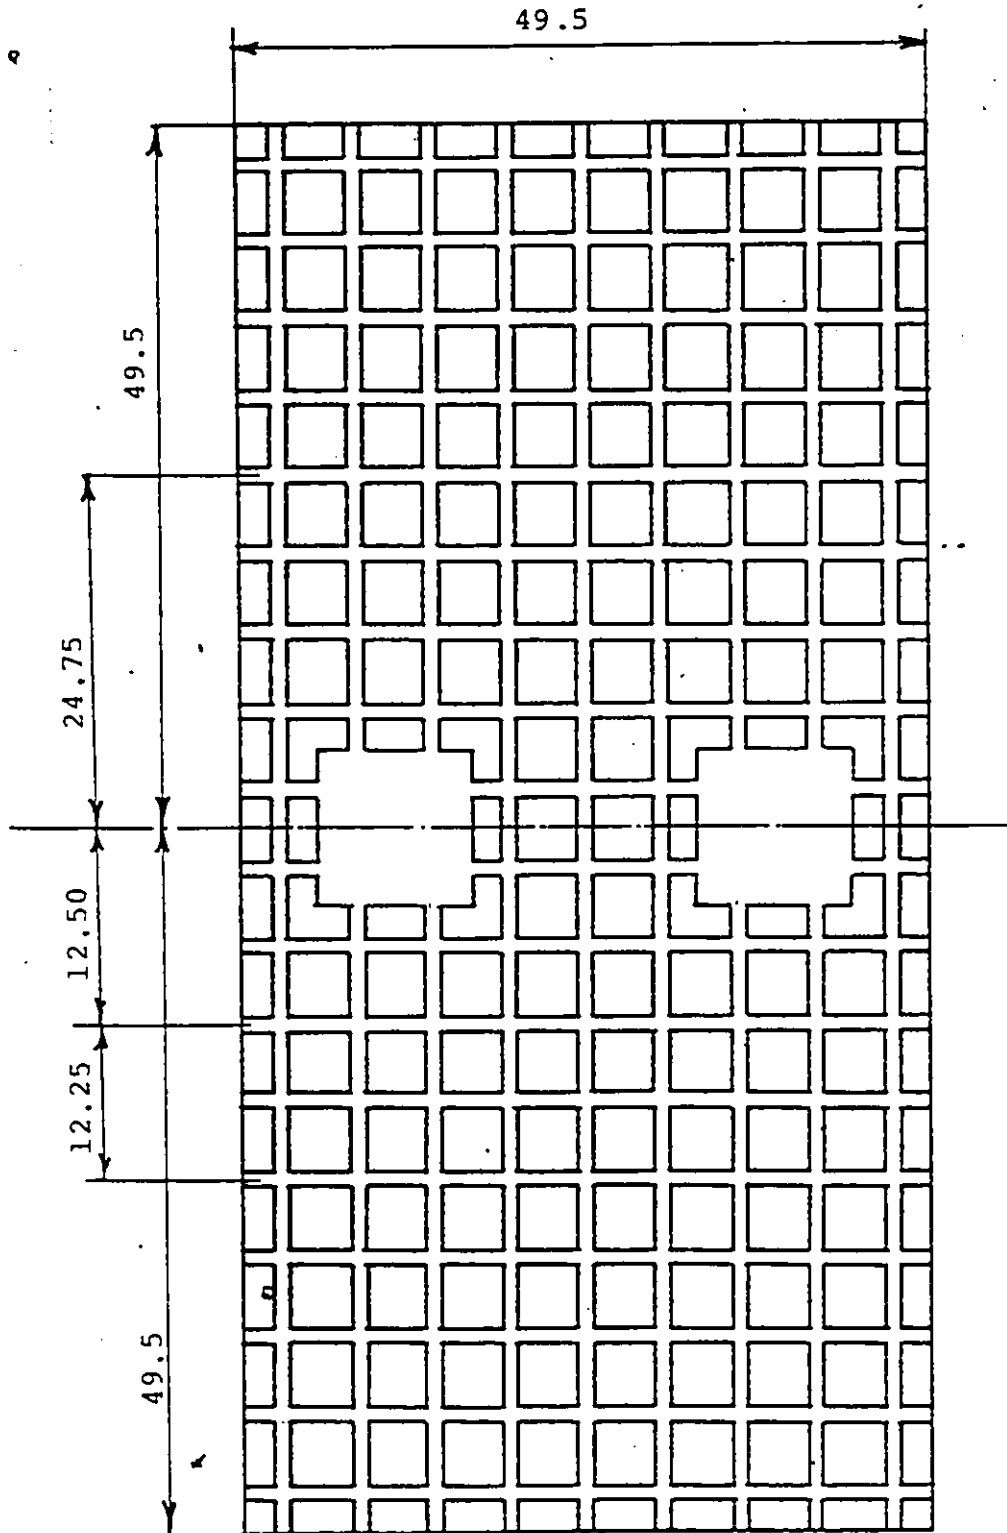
BOTTOM PLAN LAYOUT (RECTANGULAR WAFFLE SLAB PC3)
